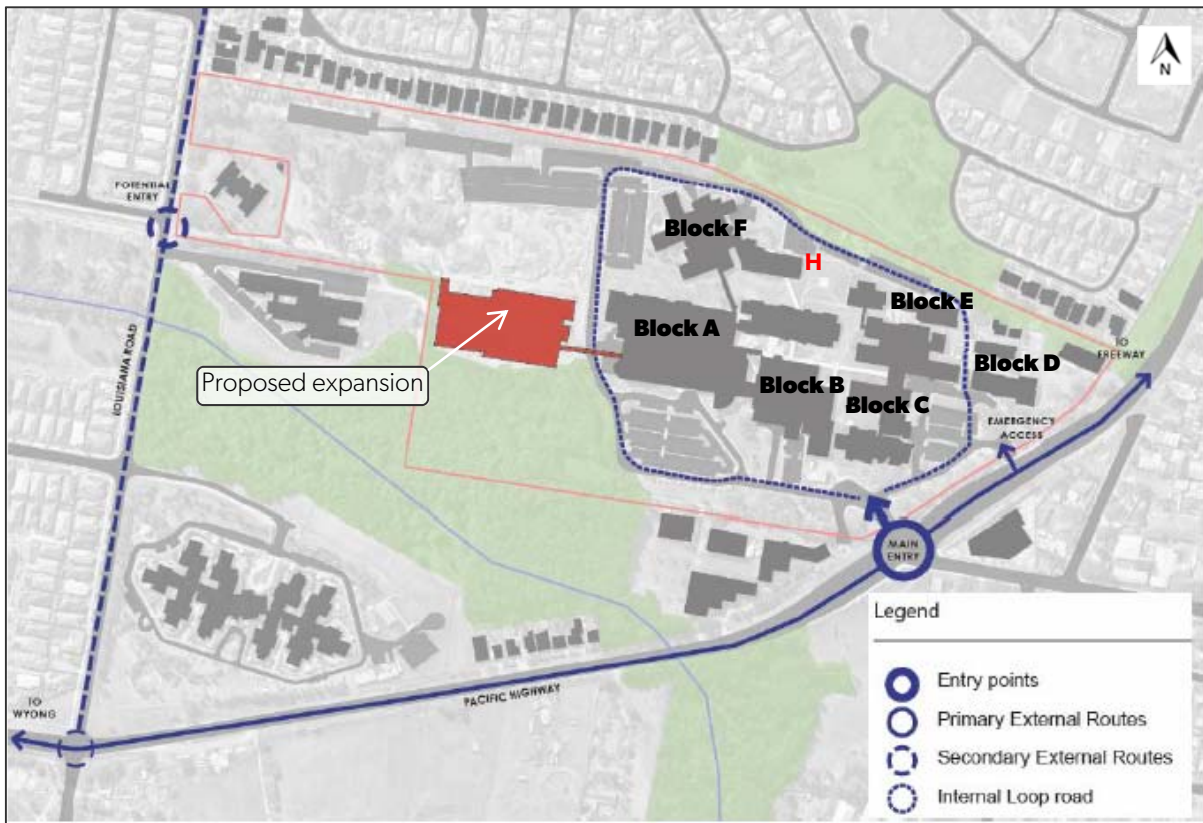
| Existing buildings and uses on site (Source: Applicant’s EIS)
